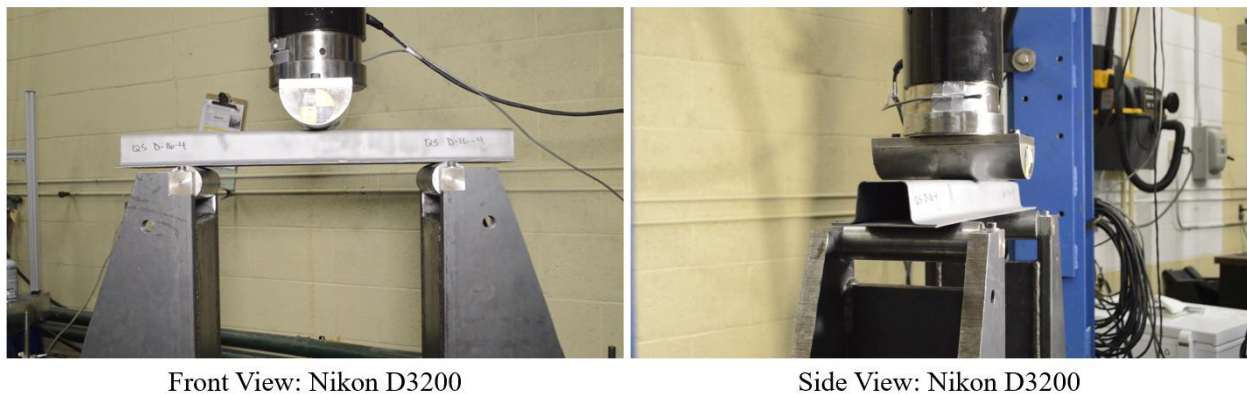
Static images from DSLR cameras of quasi-static three point bend arrangement prior to testing.
